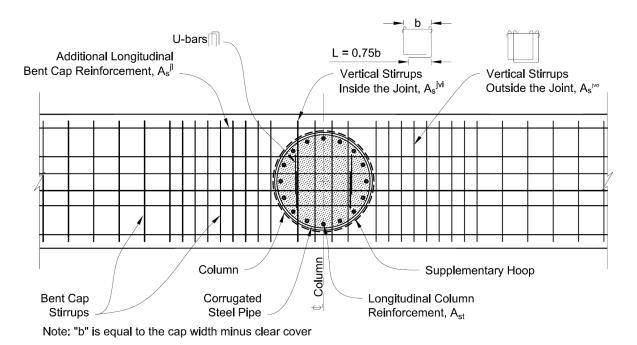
Cap Pocket Full Ductility Joint Shear Reinforcement Details (Plan)—SDCs C and D
